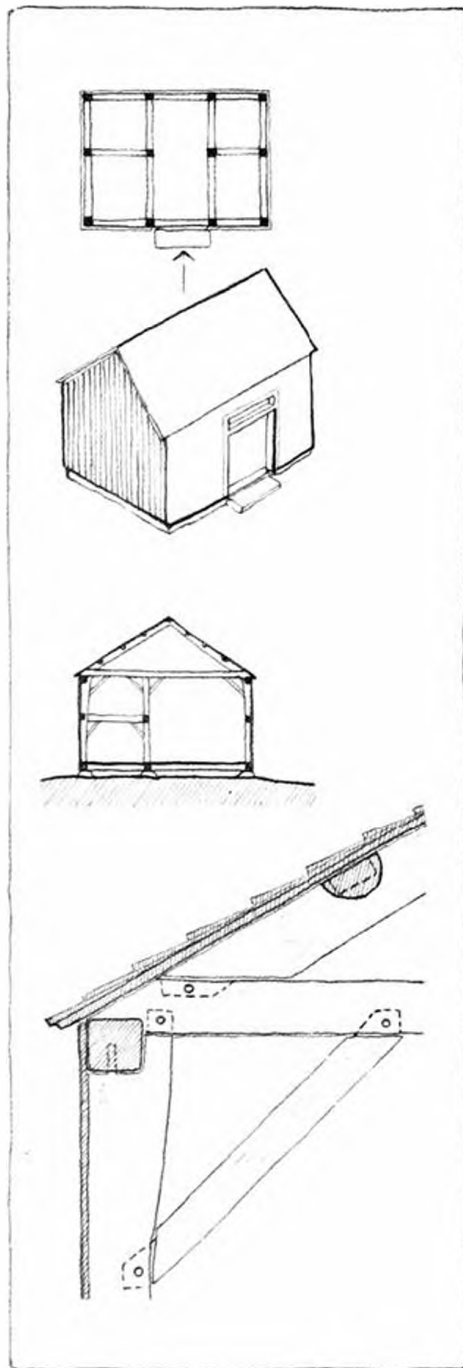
Old English barn type with a side opening door. Illustrations show a typical plan, isometric section, and a detail of the rafter-plate connection.
